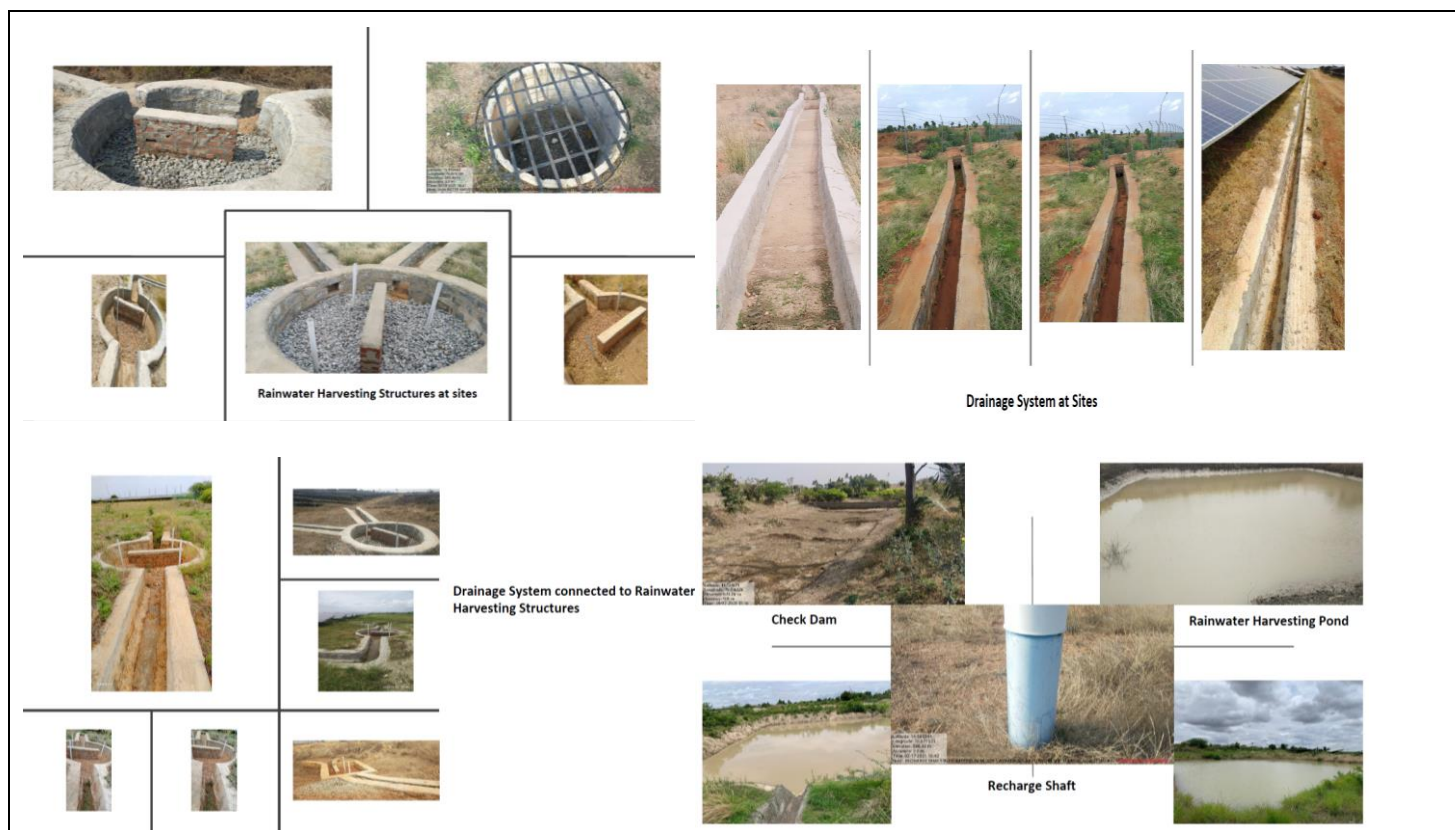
Storm water Drainage System & Rainwater Harvesting Structure & Storage Pond at Avaada sites
